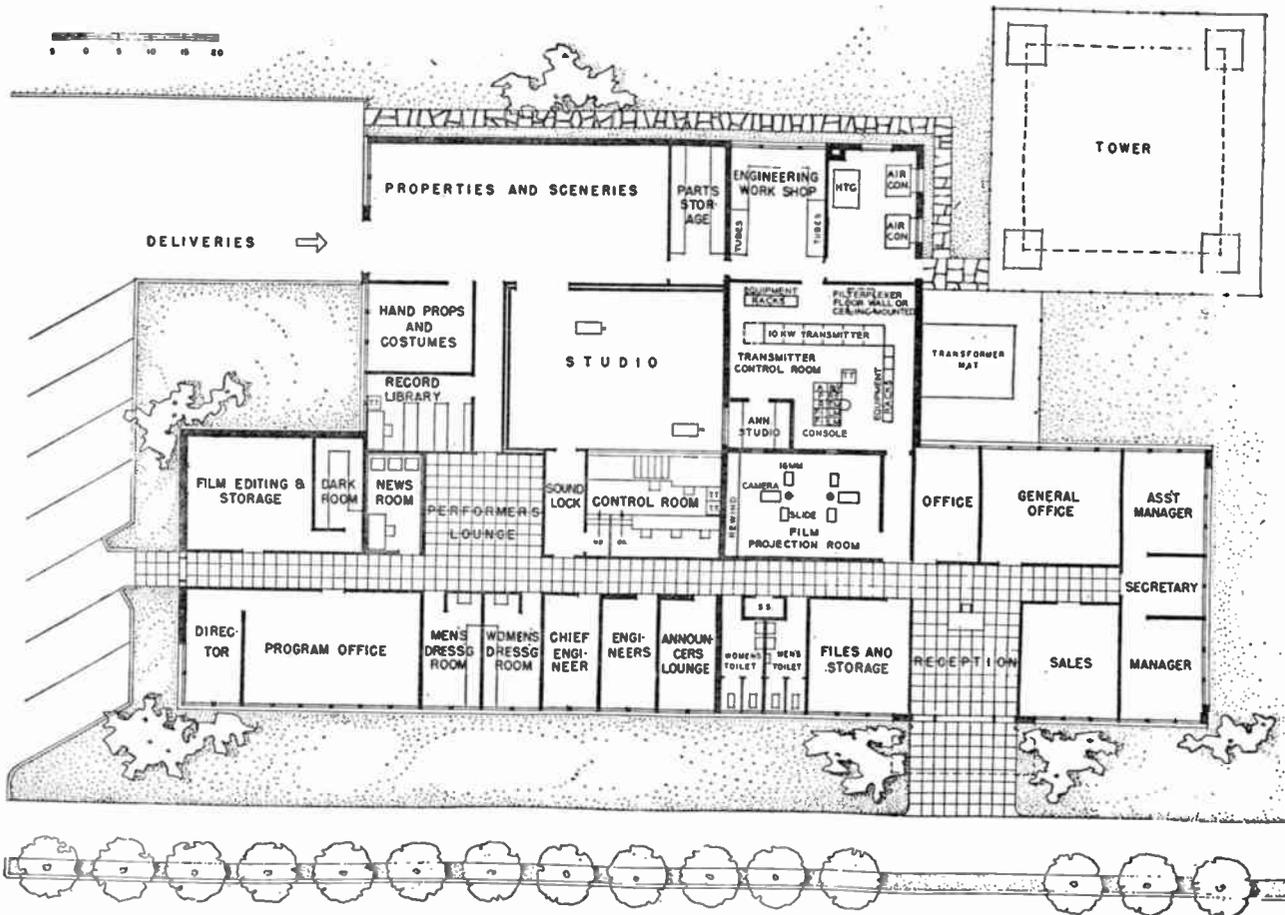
Sample Floor Plan of a One-Studio Television Station (RCA Educational Plans Booklet)
